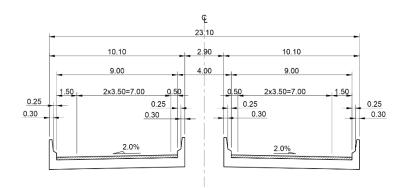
Typical Rodway Section at Bridge Section at Ultimate Stage
